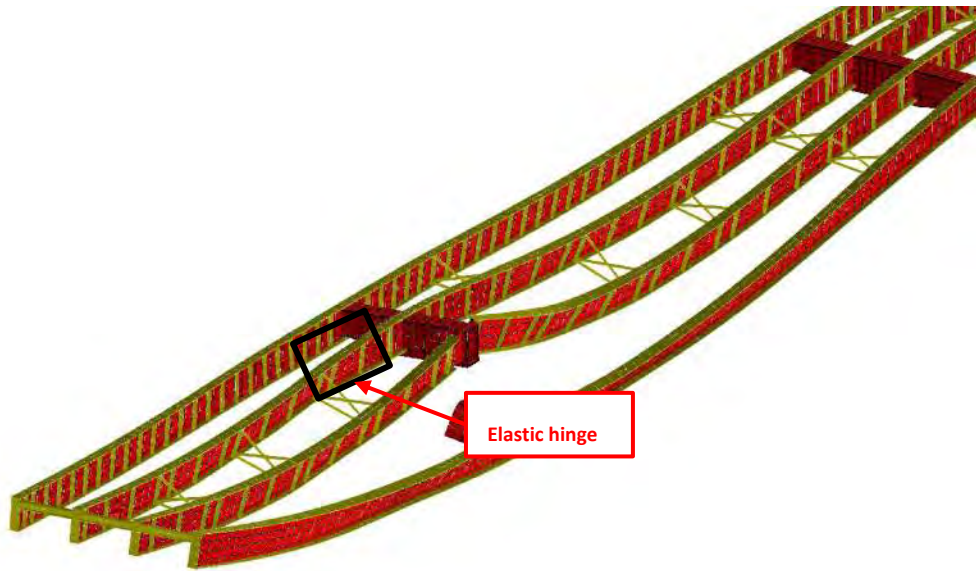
Deflected Shape After Forming Elastic Hinge on Girder C (Deck not shown for clarity)
